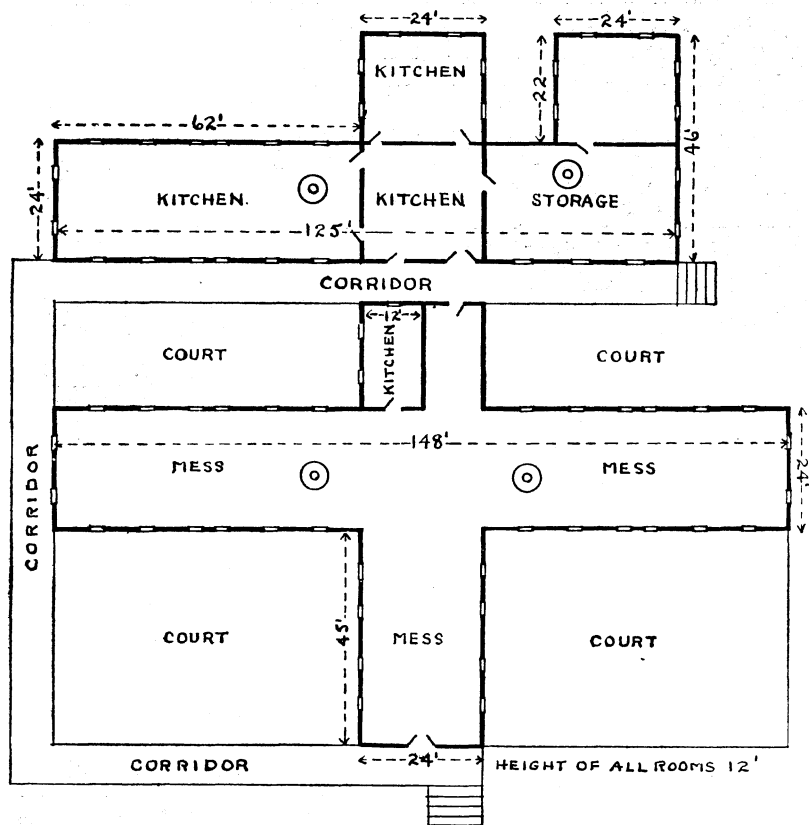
Floor plan of mess hall and kitchen and storage of building (shown in fig. 3). The construction is temporary and very loose. Fumigation with hydrocyanic acid gas for 4 hours put an end to a serious cockroach problem without endangering occupants in near-by buildings. Barrels were used according to the pot method. The fires were left burning in the kitchen
